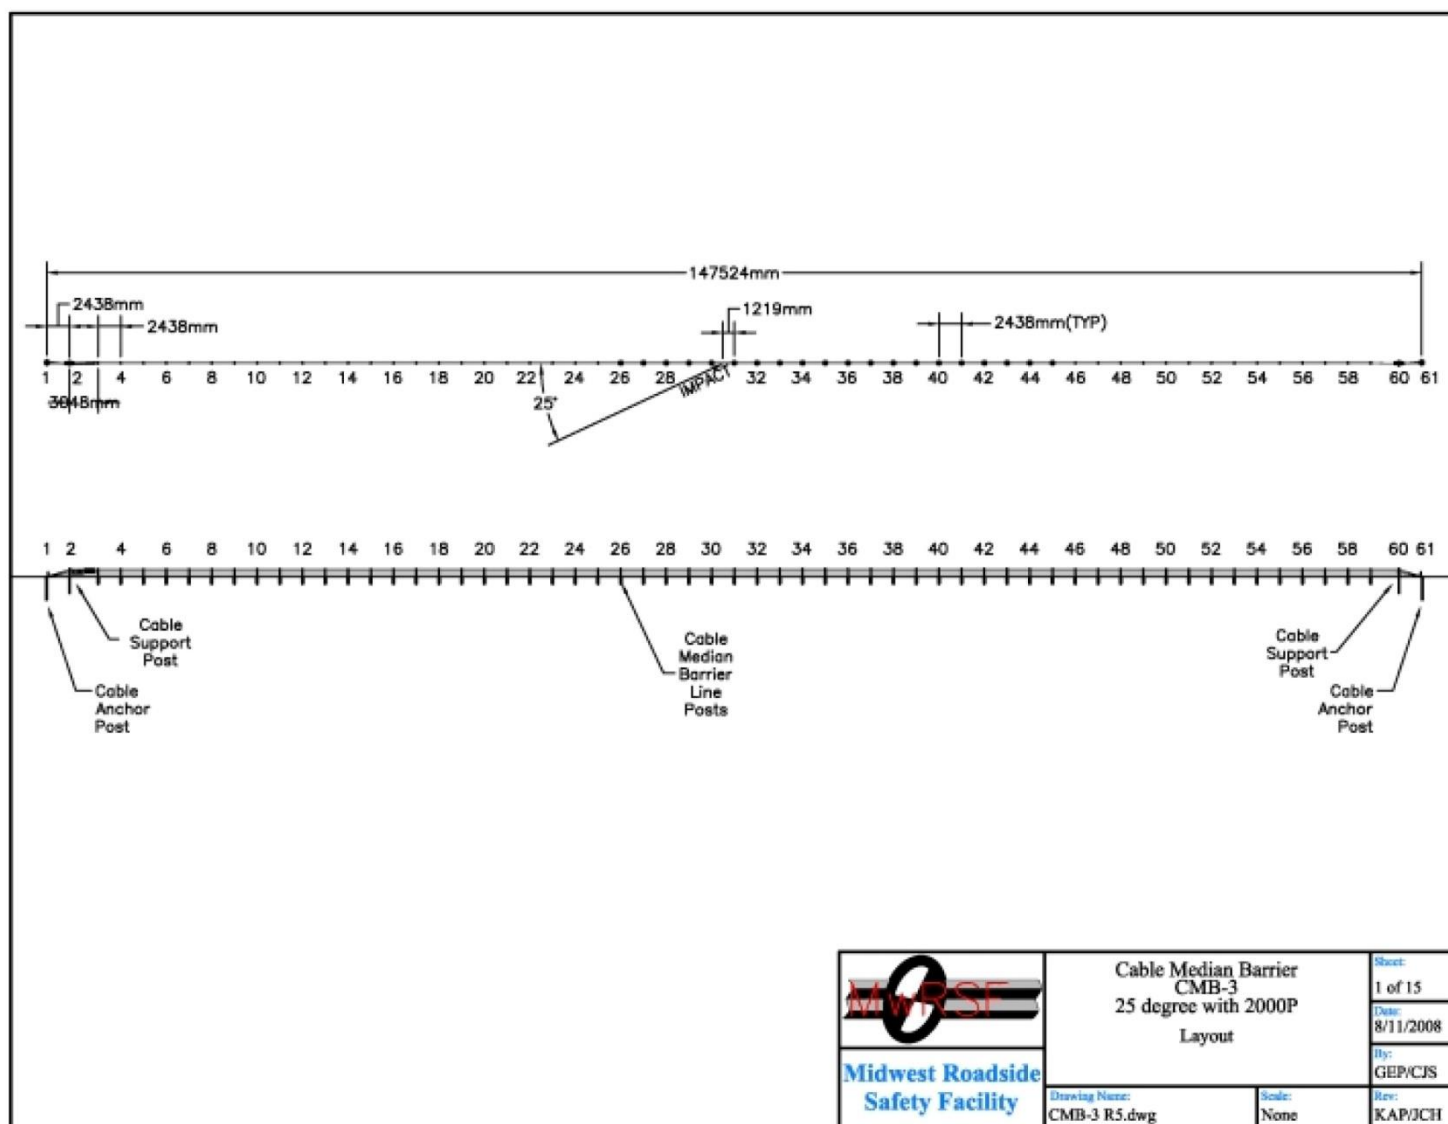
Low Tension Cable Median Barrier System Details, 2000-2008 [64]
